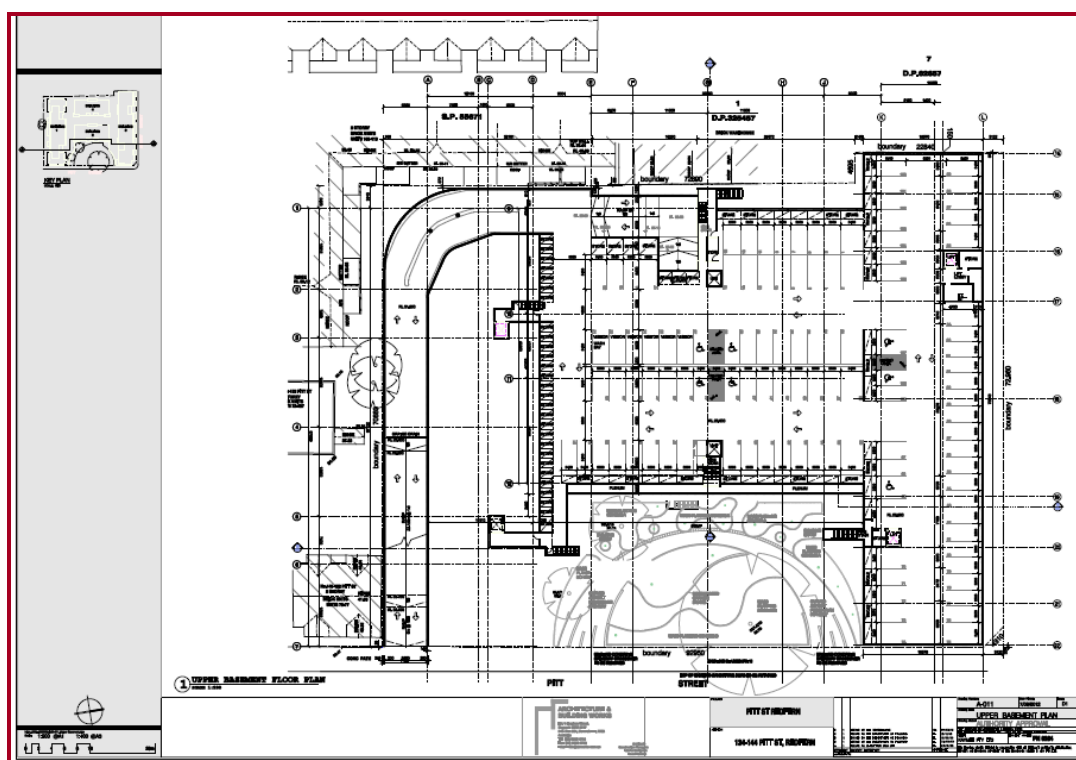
Plan of the proposed upper basement level at the subject site (Source ABC Planning Pty Ltd 'A-011 Upper Basement Level').
